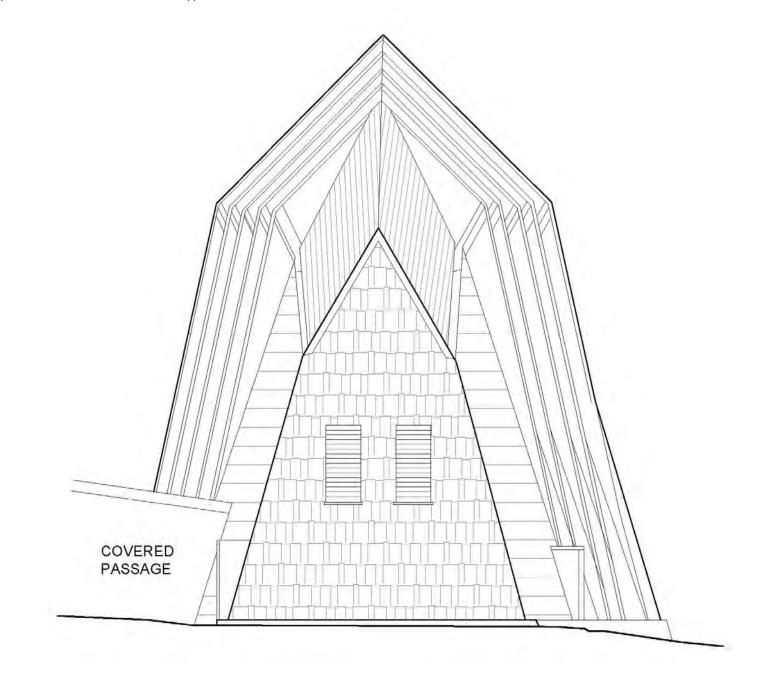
West Elevation of the Sanctuary. Prudon & Partners, A-106.00.
